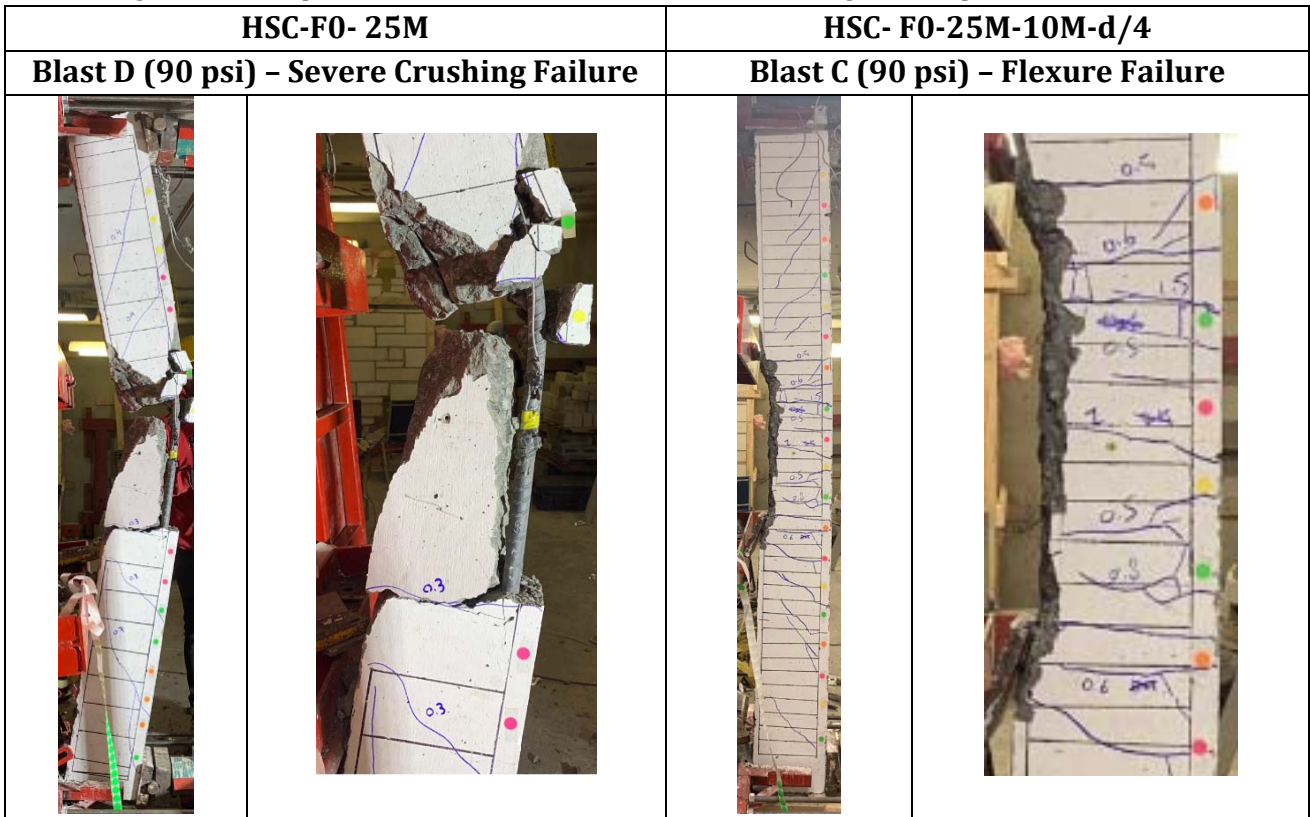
Damage and Failure Modes of the 25M series with nominal detailing and blast detailing
